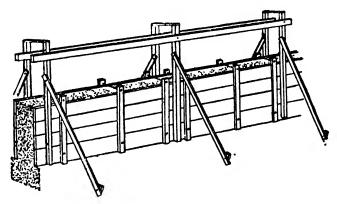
Fig. I..—Showing how a Wall is made by pouring Concrete between Parallel Boards, or "Shuttering" as it is termed.
